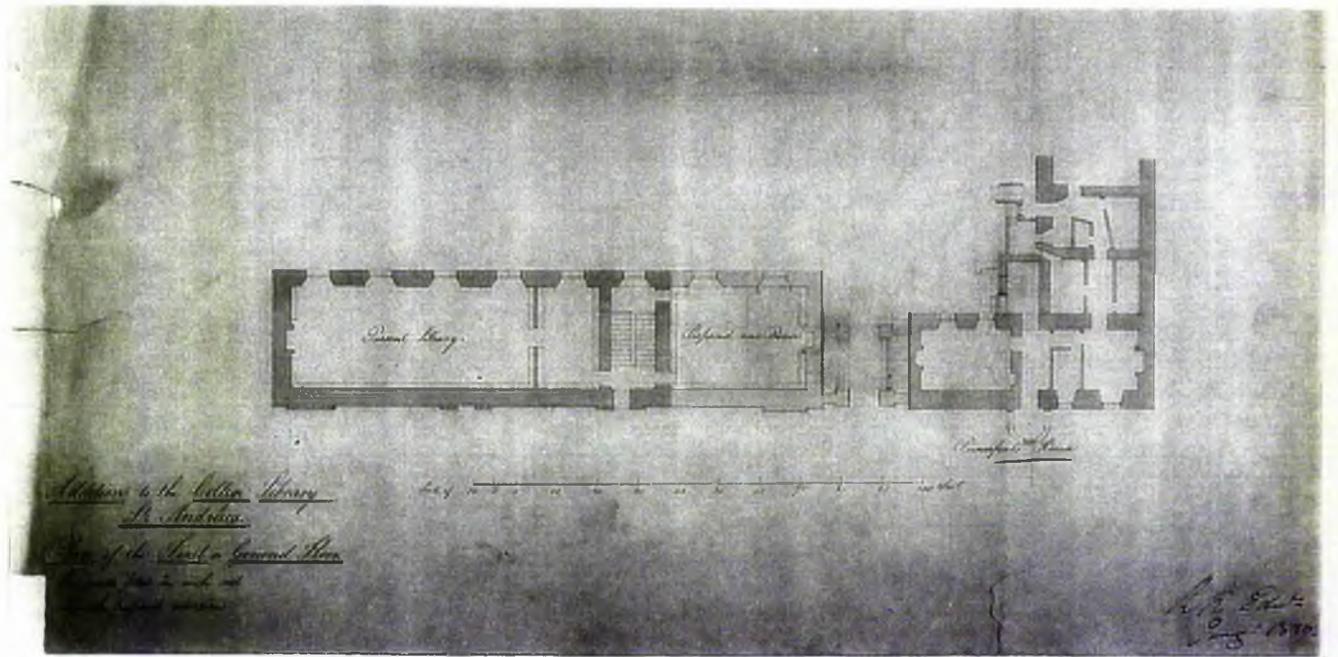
Library Extension. Ground Floor plan. R. Reid, January, 1827.
